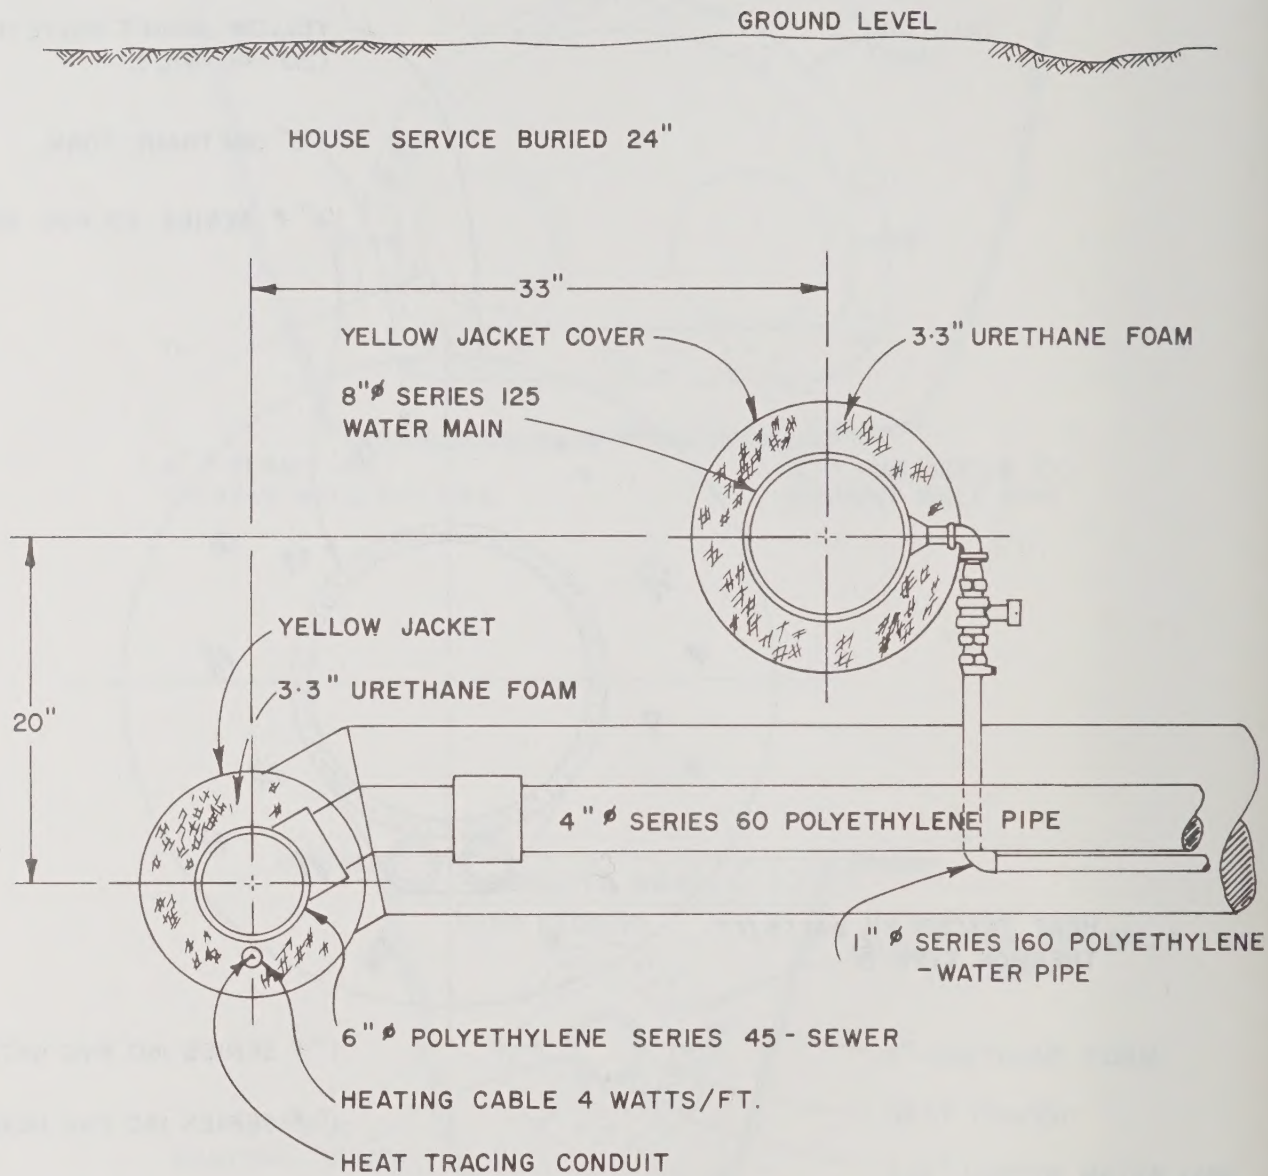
SECTION - HOUSE SERVICE, RANKIN INLET - NEW SYSTEM
